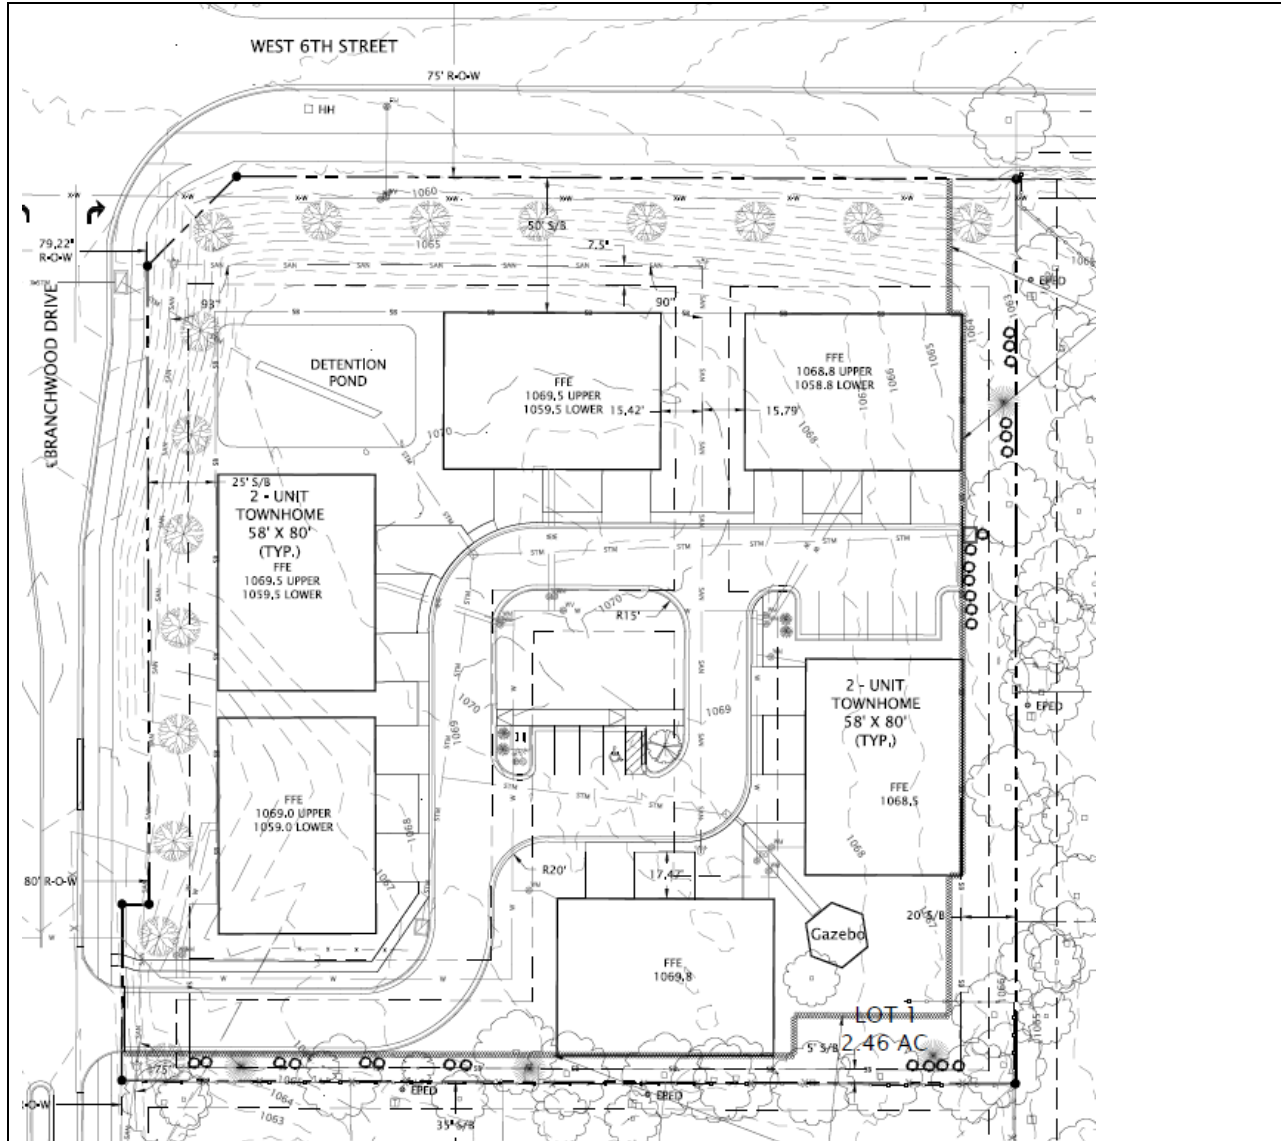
Proposed Preliminary Development Plan with proposed landscaping.
